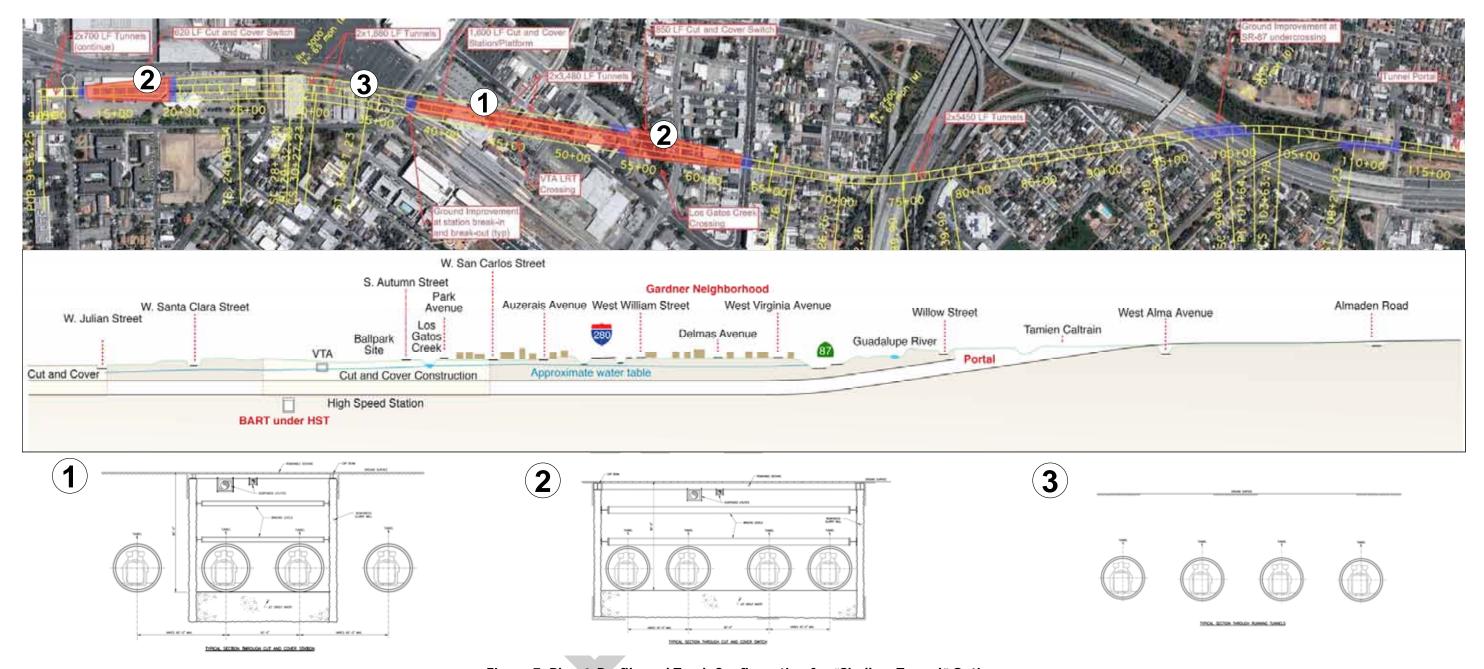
Plan & Profile and Track Configuration for "Shallow Tunnel" Option
